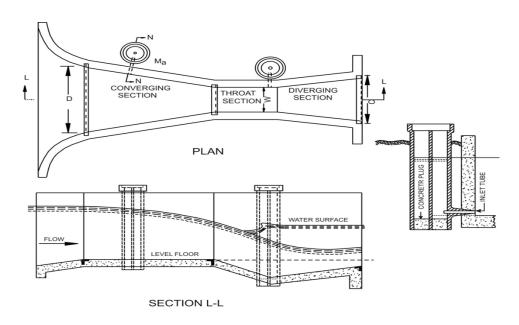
PLAN AND SECTION OF PARSHALL MEASURING FLUME
